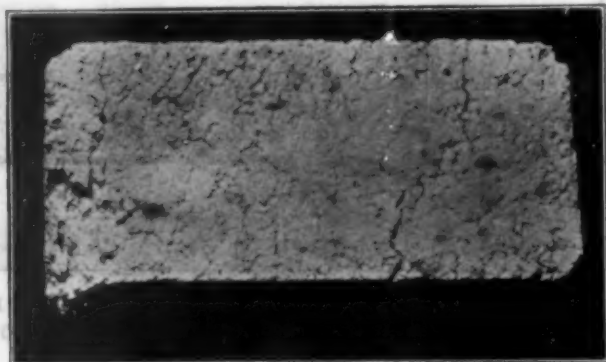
AN EXAMPLE OF BAD MOLDING AND FIRE CRACKING
